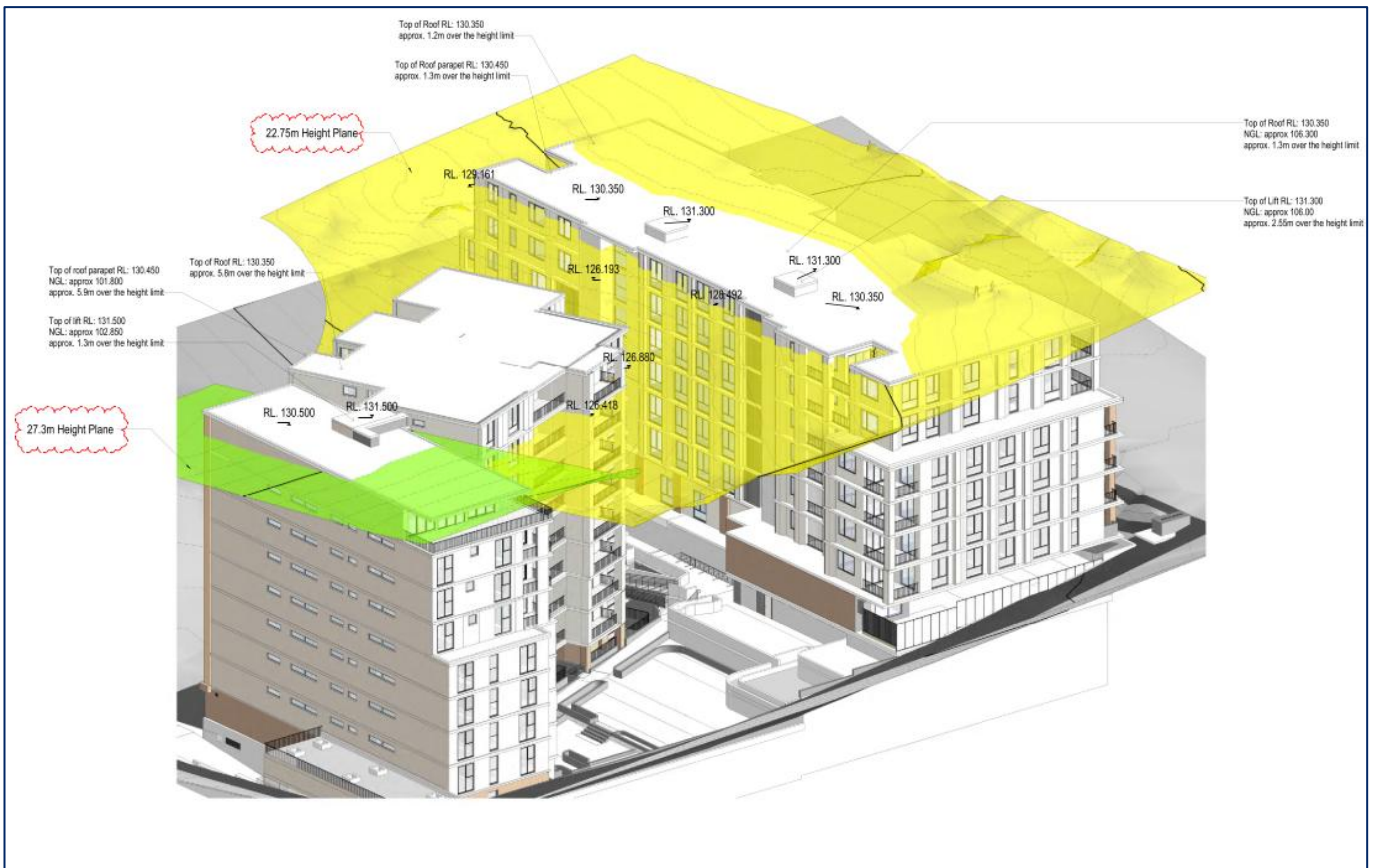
| Rooftop elements of Buildings A & B protruding above the maximum permissible height planes (Source: RtS)
